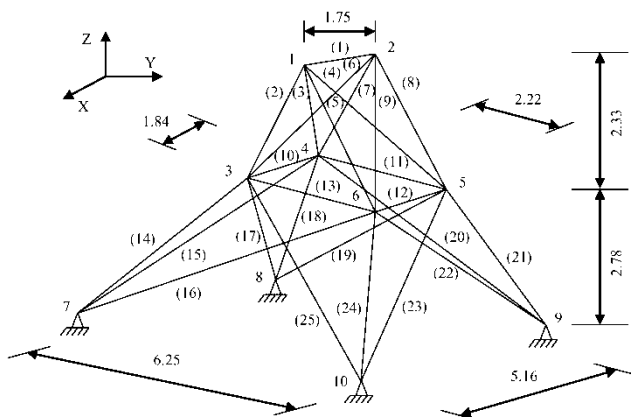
Twenty-five-bar space smart truss structure (units: m)
